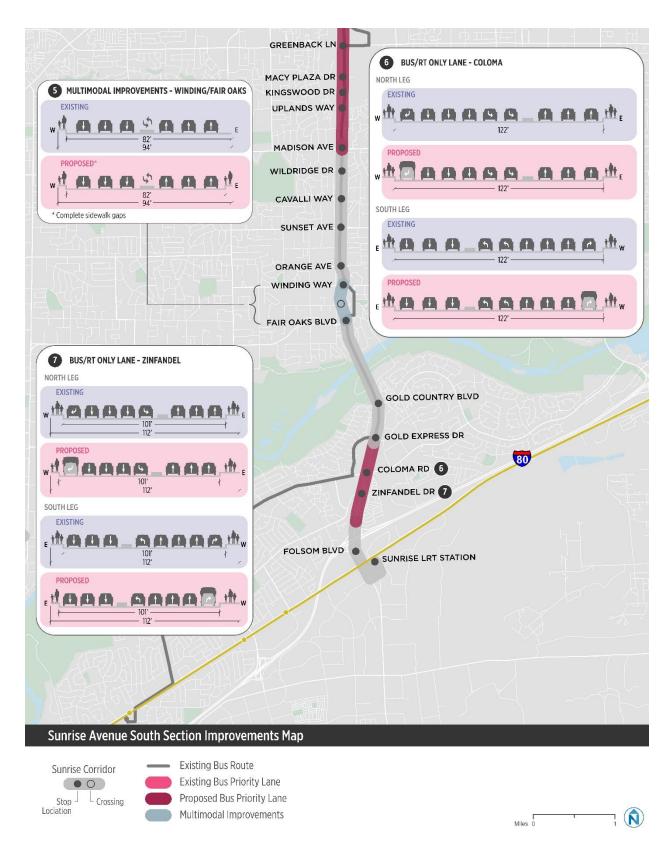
Sunrise Boulevard (South Section) Cross Sections Map
